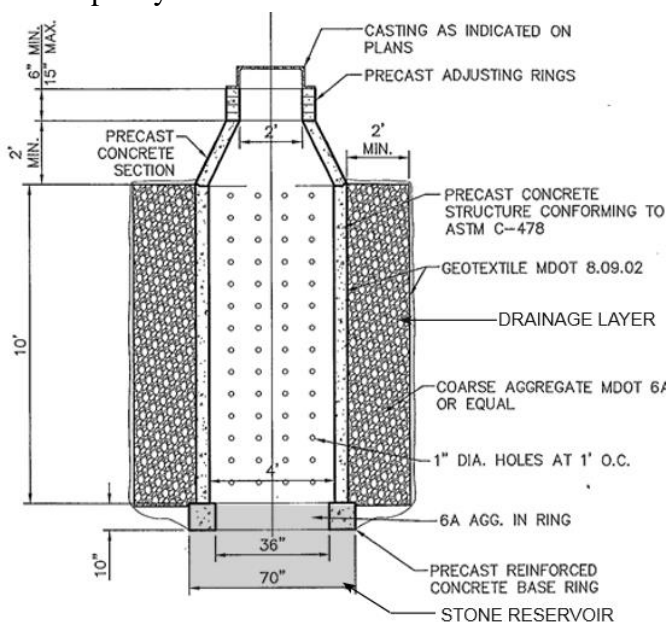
Leaching Basins with the plan layout (Source: Wise, 2008).
